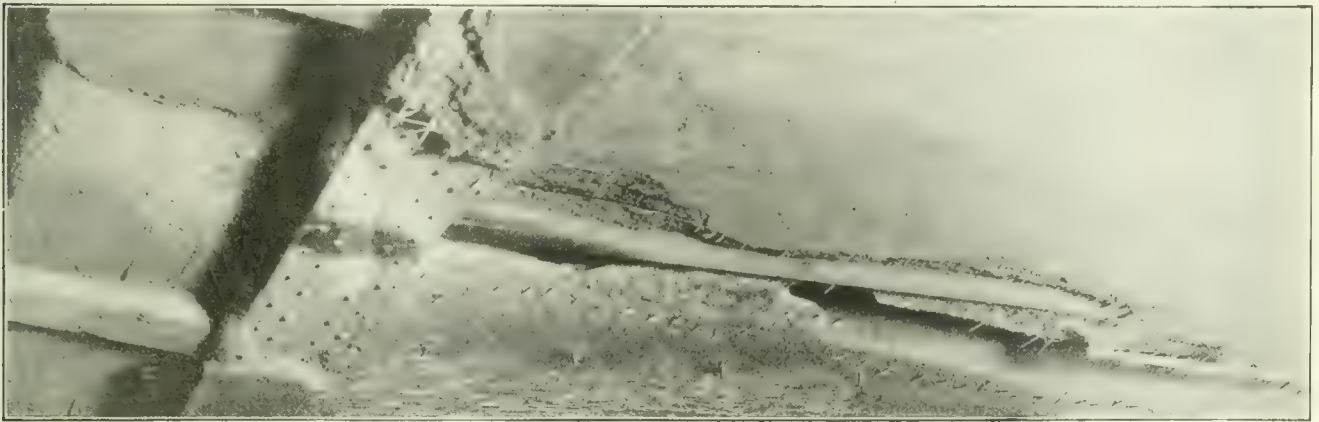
CONCRETE CASING UNDER LAKE ST. BRIDGE
